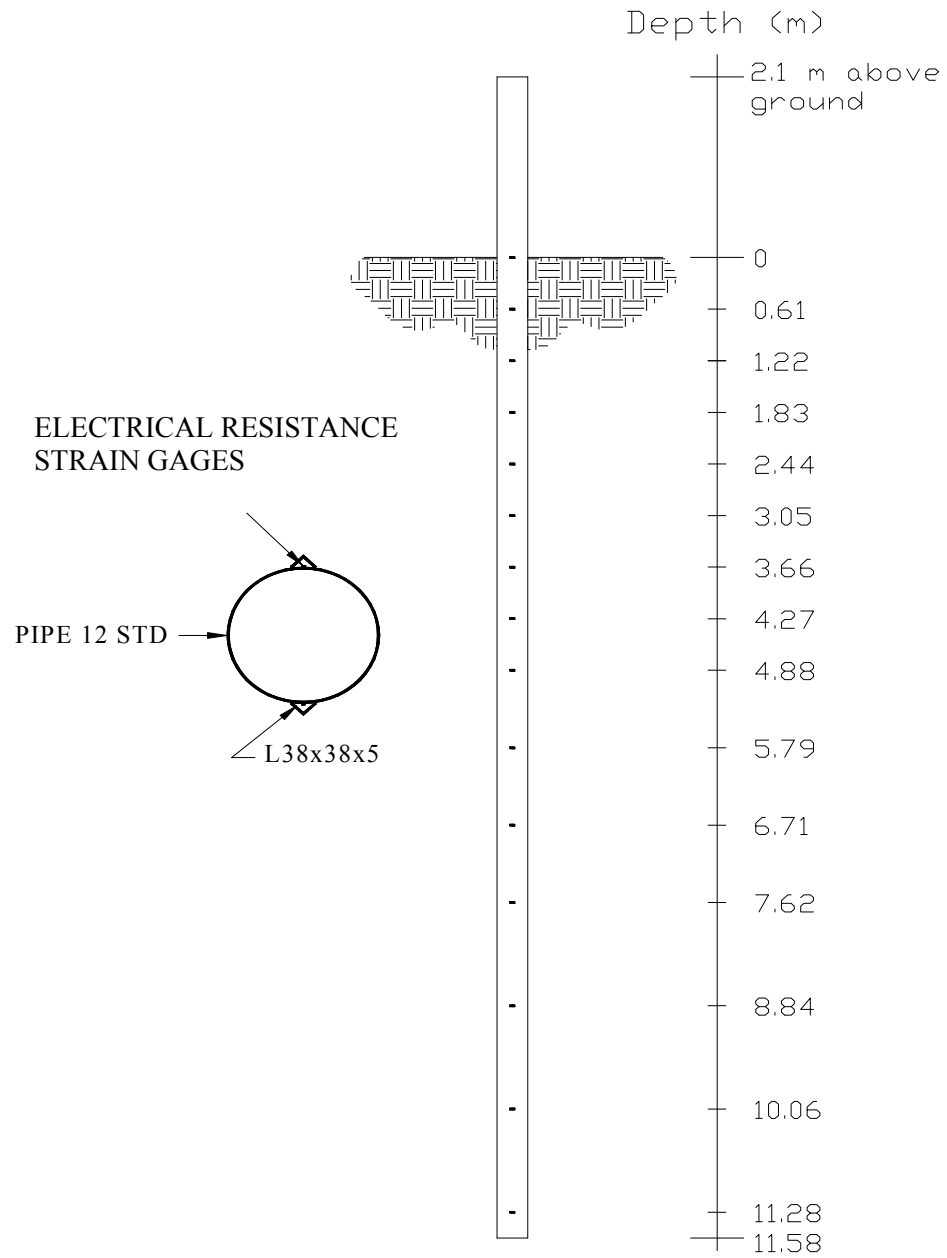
Plan and profile of a single pile with strain gage locations.
